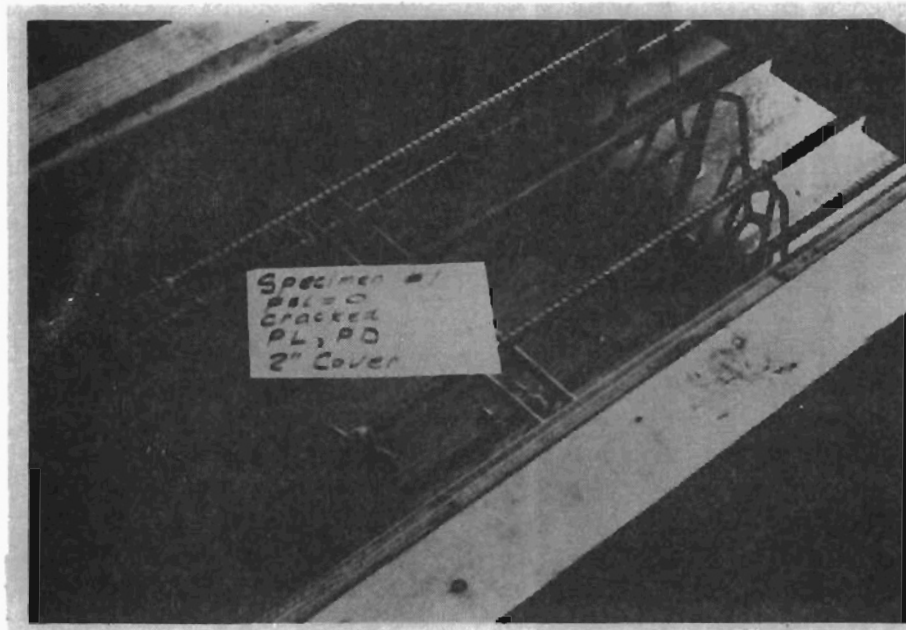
Reinforcement tied to chairs in unbonded specimen; wood positioning template and coil ties in place
